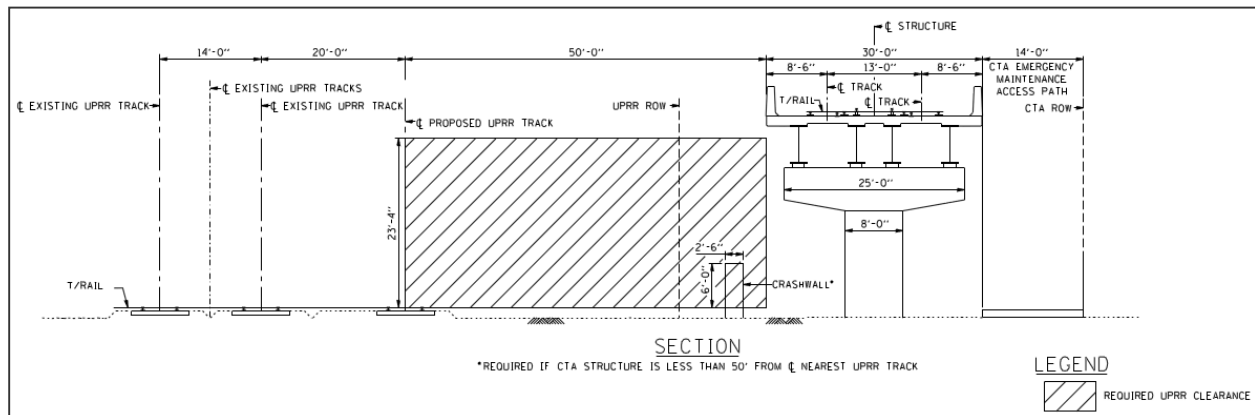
UPRR Rail Alternative East Option Typical Cross Section
